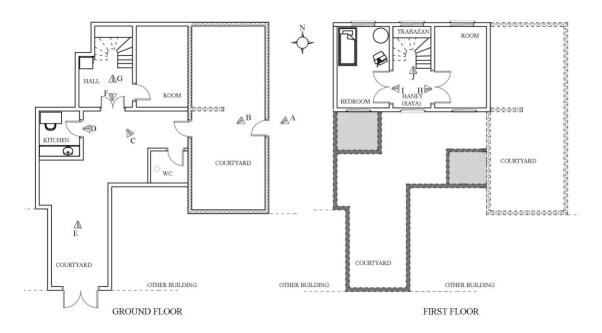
Mustafa Orșahin House, ground and first floor plans (S.Sevimbige archive, 2017)
